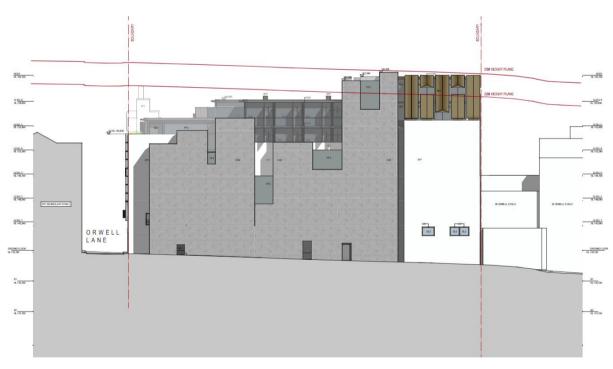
22m-25m Height Plane – Northern Elevation (Source: Tonkin Zulaikha Greer Architects)
